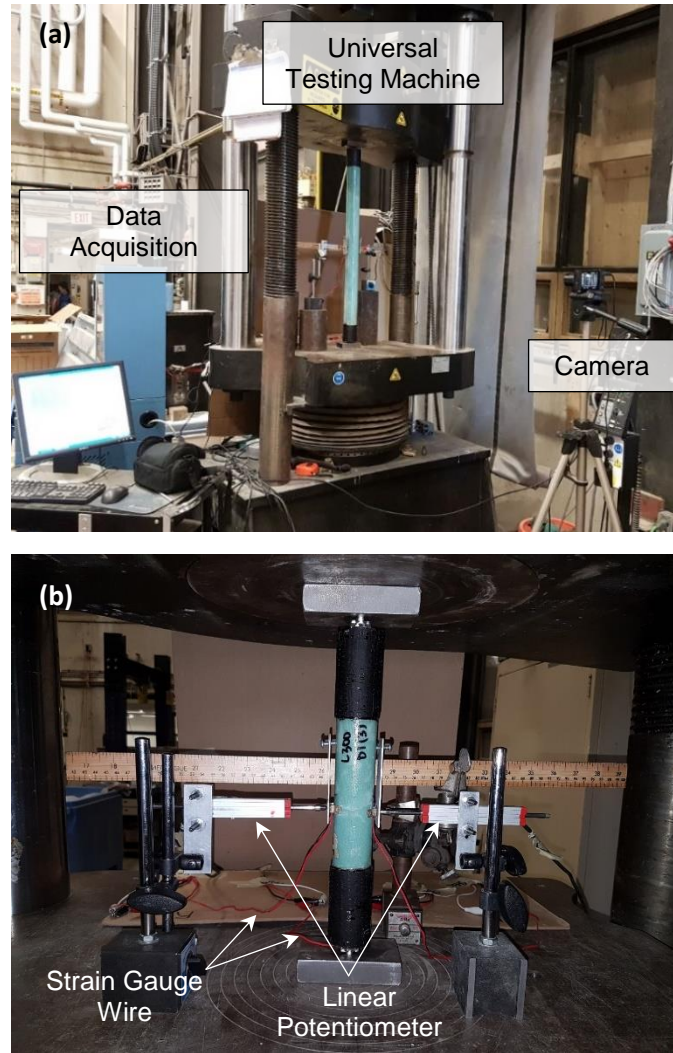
Test set-up: (a) overview and (b) close up of set-up of Specimen L300 D1 showing external instrumentation.
